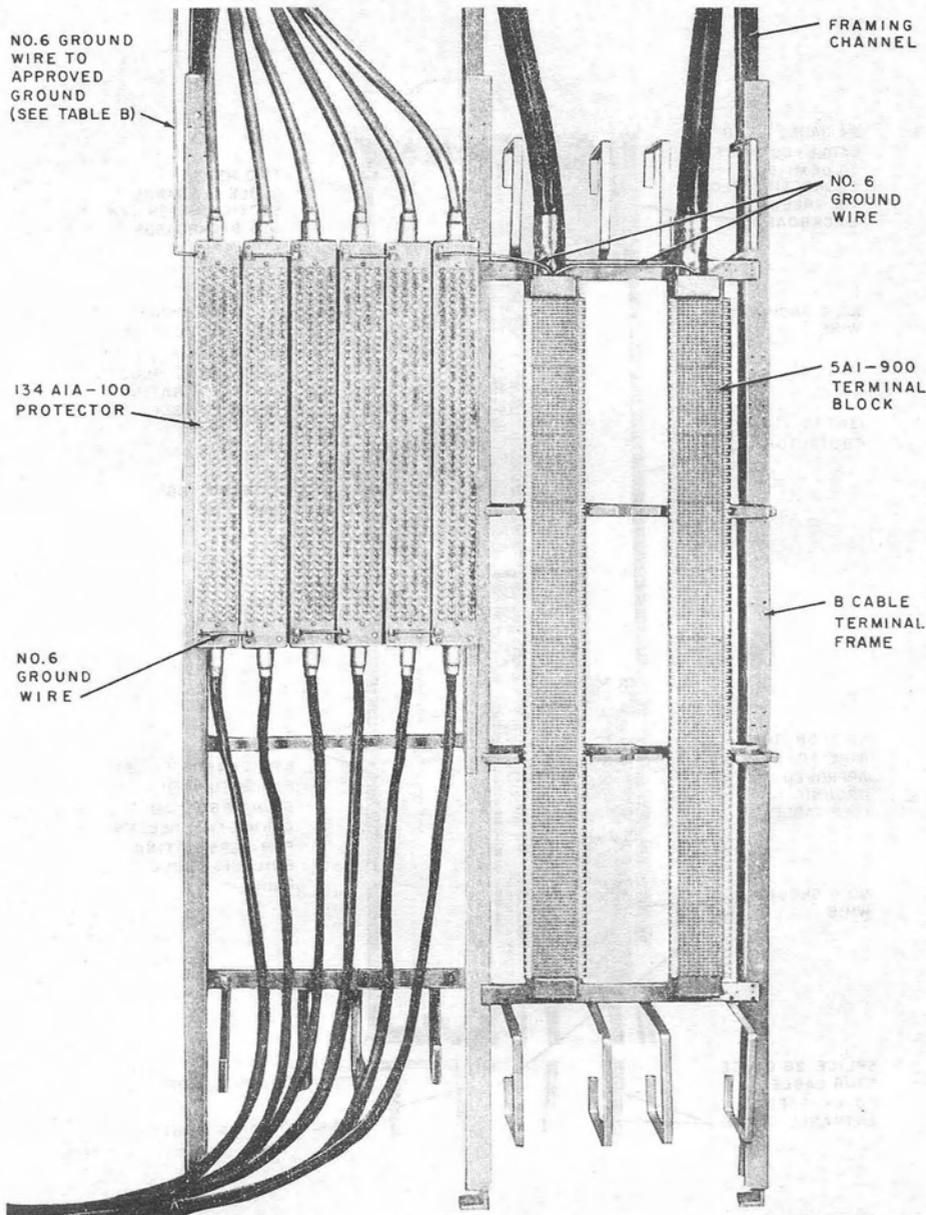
134A1A-100 Protectors and 5A1-900 Terminal Mounted on B Cable Terminal Racks
